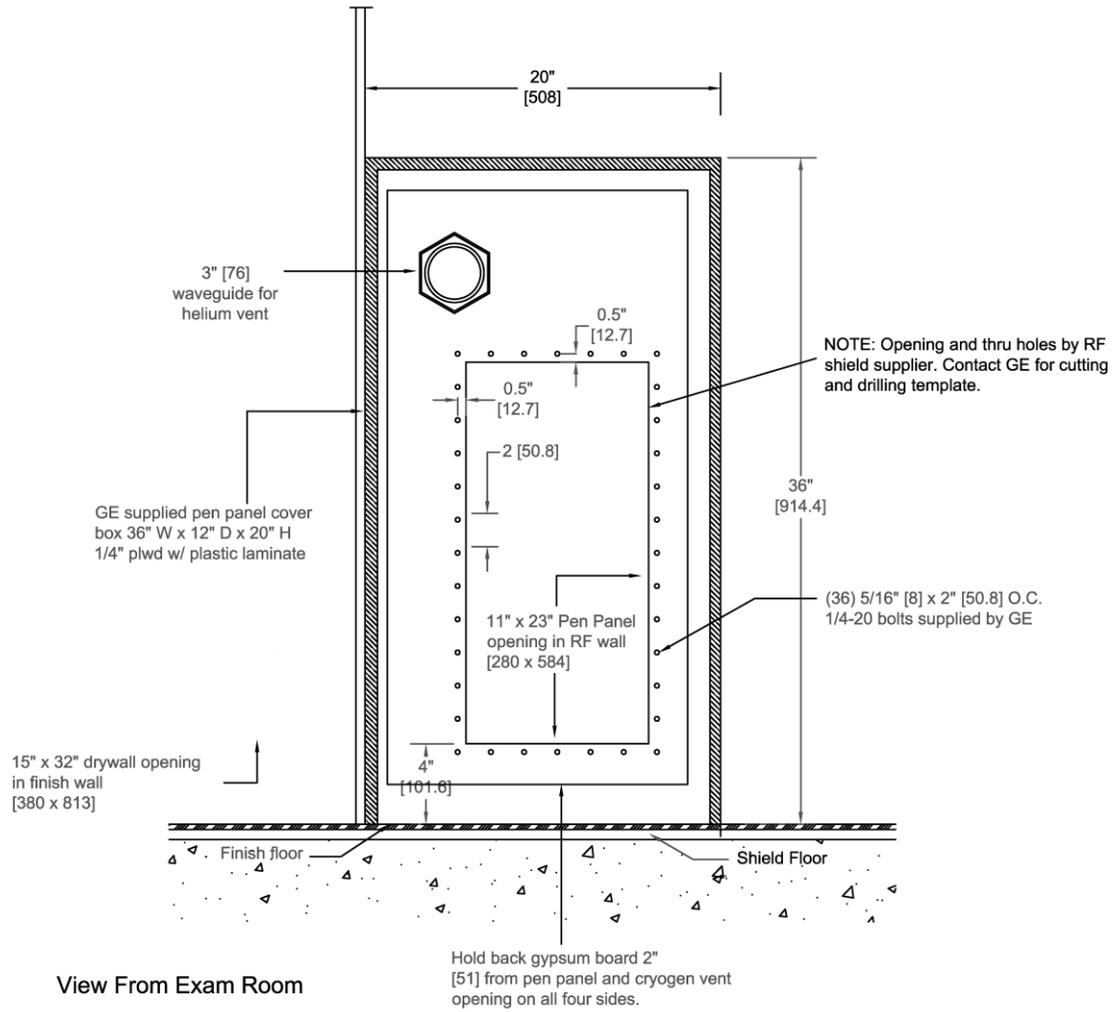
Exam room elevation showing penetration vertical panel opening & helium vent waveguide penetration.
